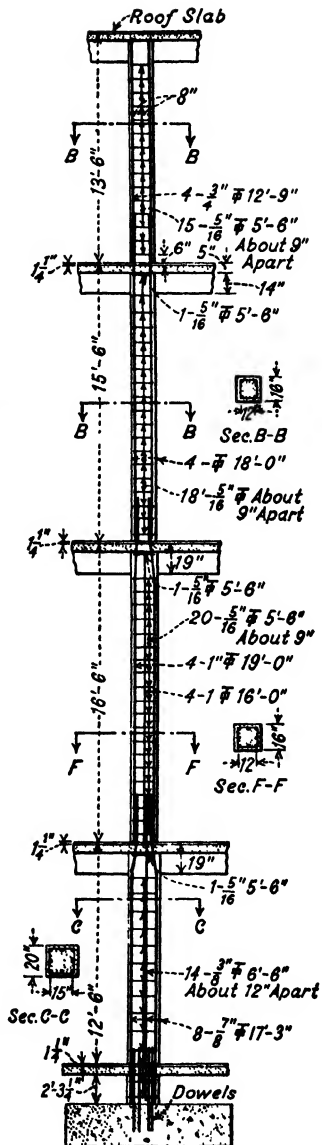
Typical Column with Vertical Steel Only. (See p. 418.)
